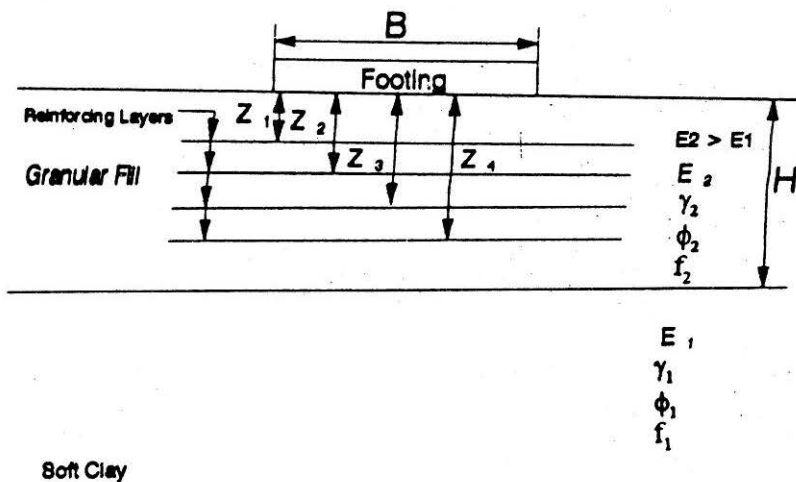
Strip Footing on a Reinforced Two-layered Soil System
